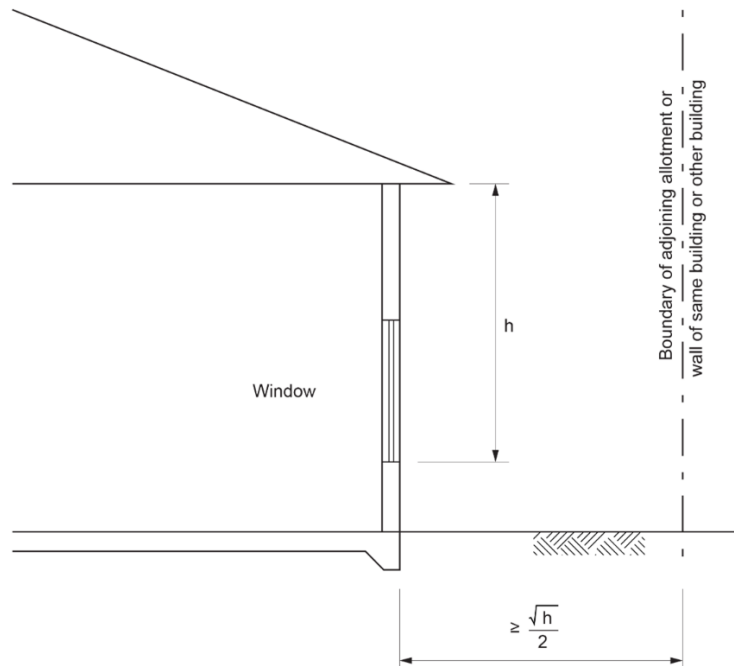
Elevation showing method of measuring distances of window from a boundary or the external wall of another building on the allotment
